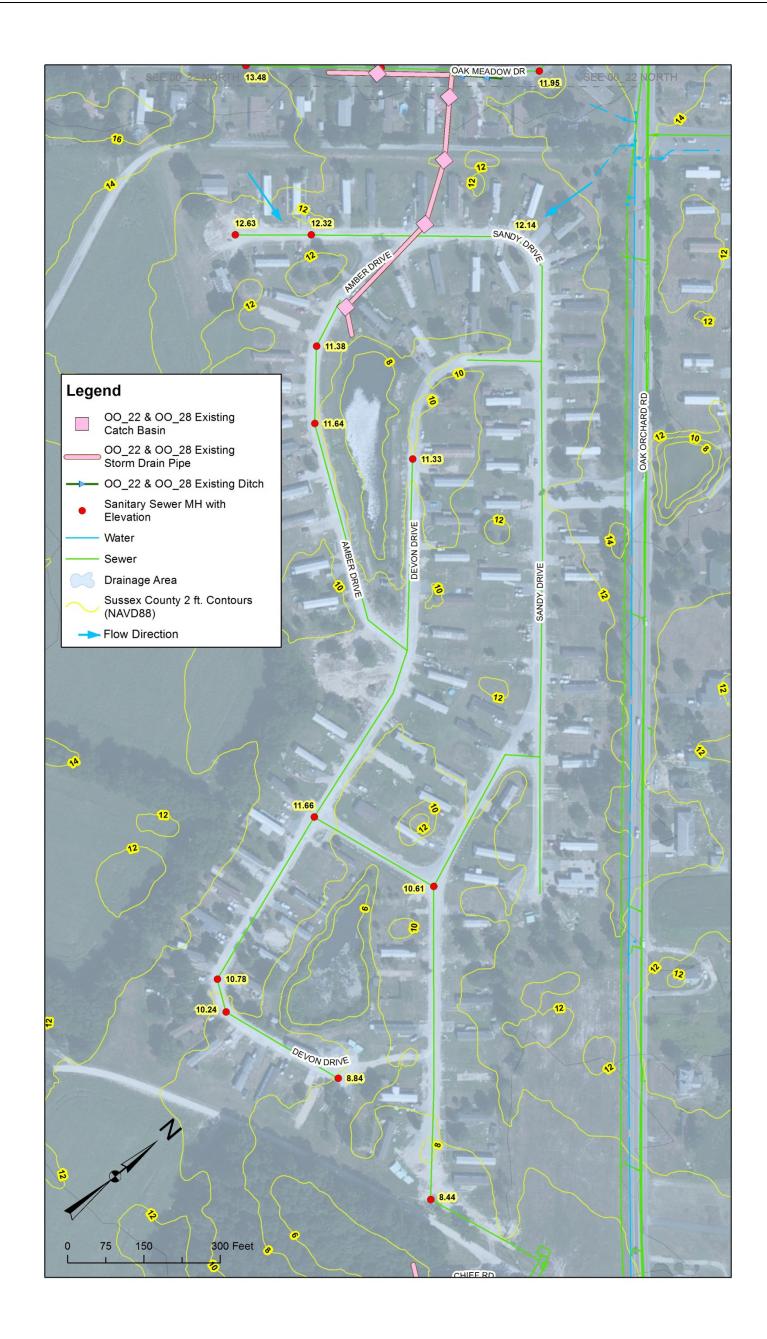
OO_22 / OO_28 South Existing Site Conditions
